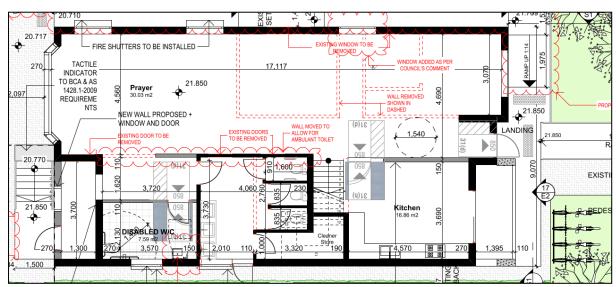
Extract of the proposed ground floor plan in the current modification application.
